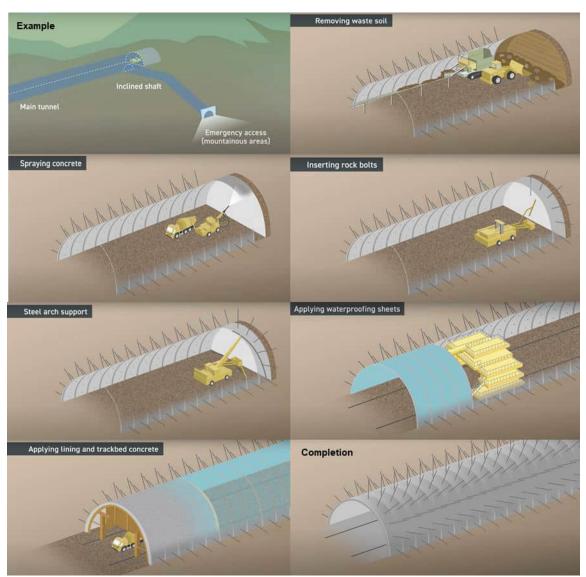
Examples of NATM Tunnel Construction [W-99]
